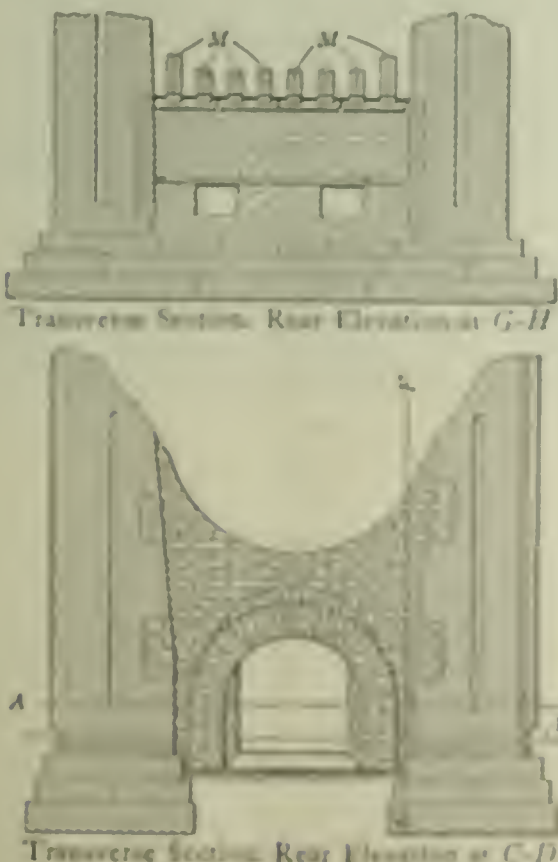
SECTIONAL VIEWS OF THE KILGOUR BOILER SETTING.
